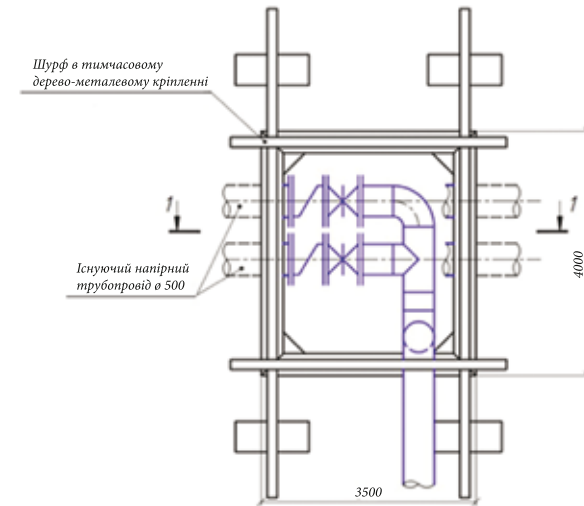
Schematic drawing showing the erection of a temporary switching chamber for temporarily diverting wastewater
